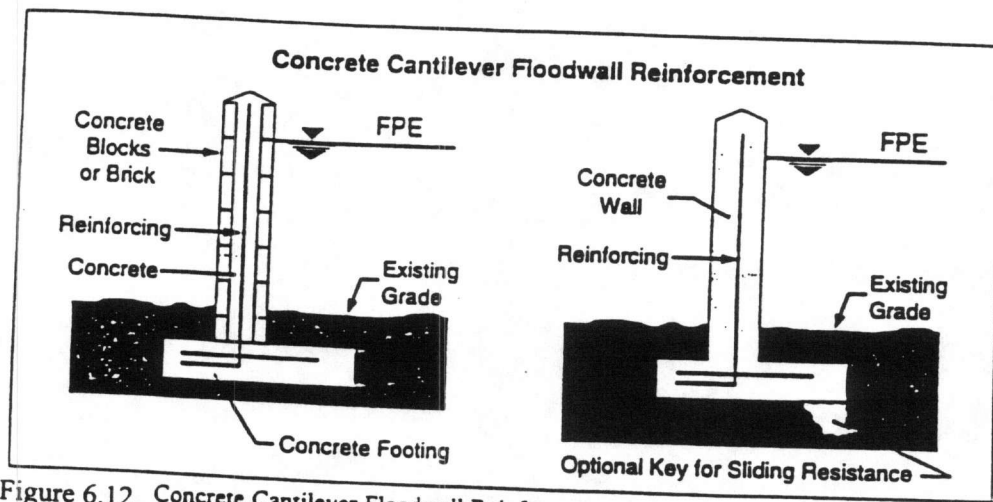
Concrete Cantilever Floodwall Reinforcement
